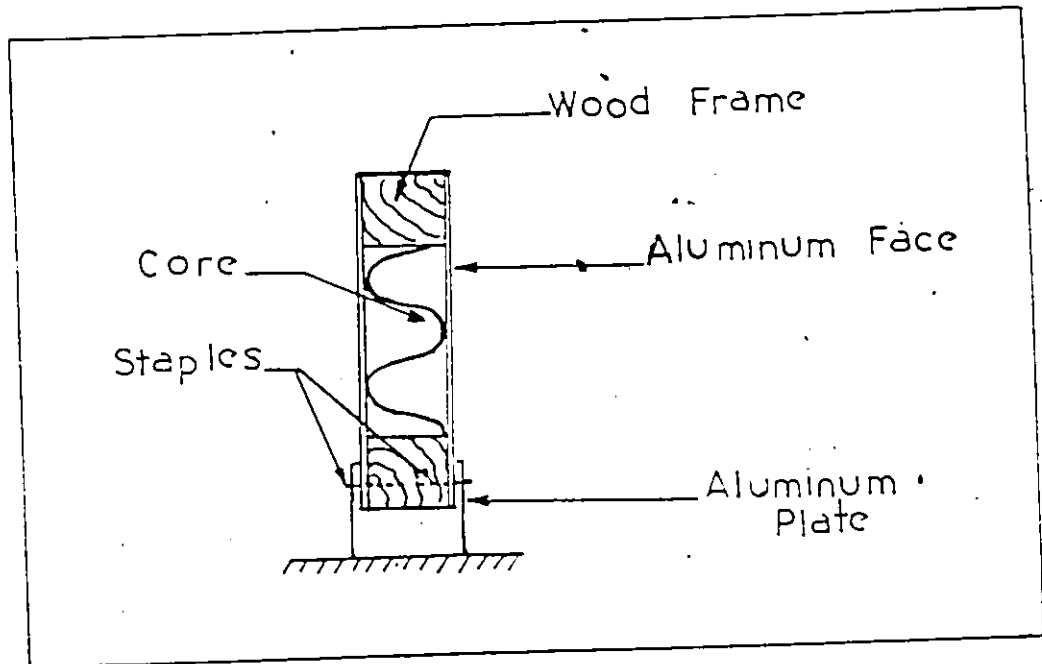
PICTORIAL CROSS SECTION OF THE CONNECTION JOINING THE PANEL TO THE ALUMINIUM EXTRUSION
